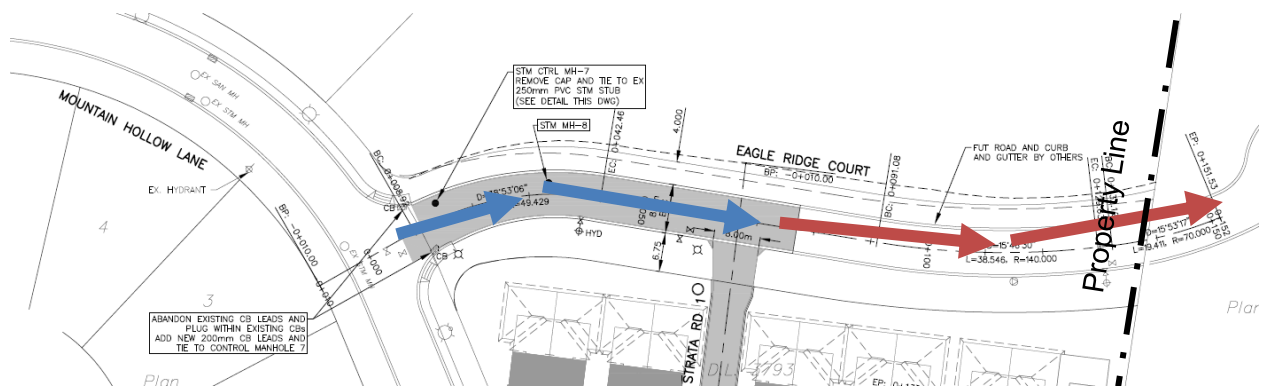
Proposed Access from Mountains Hollow Lane to Subject Property
